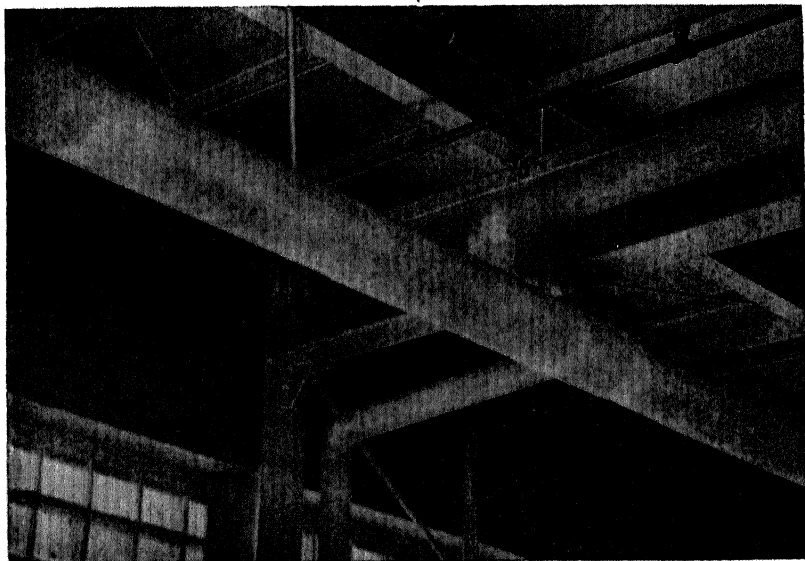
Savings in insulating time and cost are especially large where T connections are encountered. The insulation can be cut with a knife to fit the T. Cementing and patching are not required. This welded piping installation illustrates this point.
